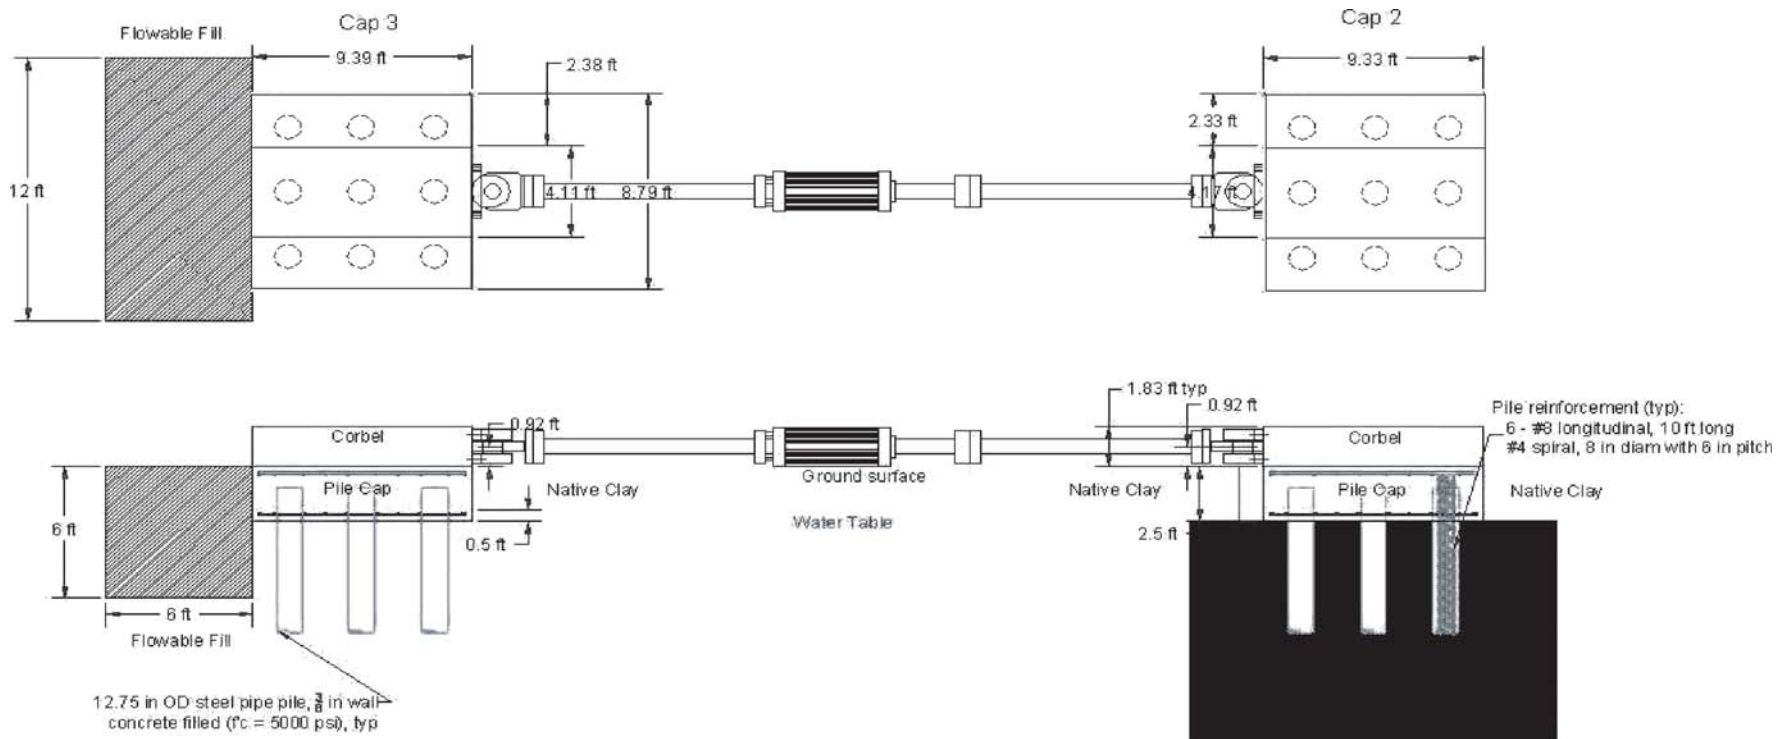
Plan and profile views of Cap 3 (left) and Cap 2 (right) during Tests 10 and 12. Test 10 performed with flowable fill adjacent to pile cap and Test 12 performed after excavation of flowable fill adjacent to cap.
